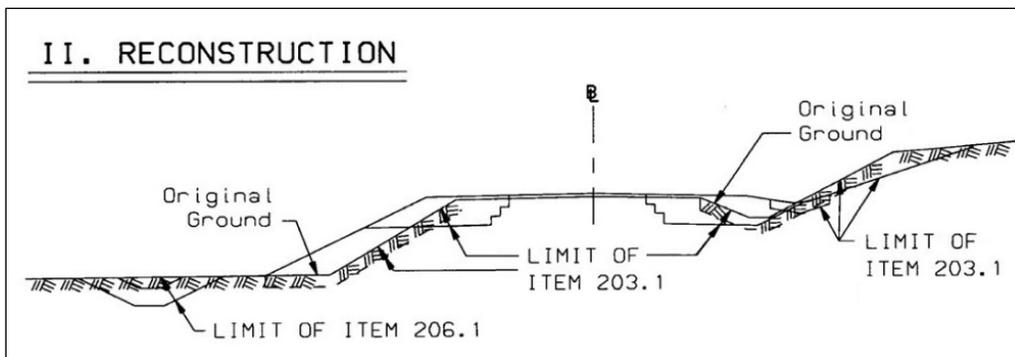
4: Roadway and Ditch Excavation Pay Limits – Reconstruction
